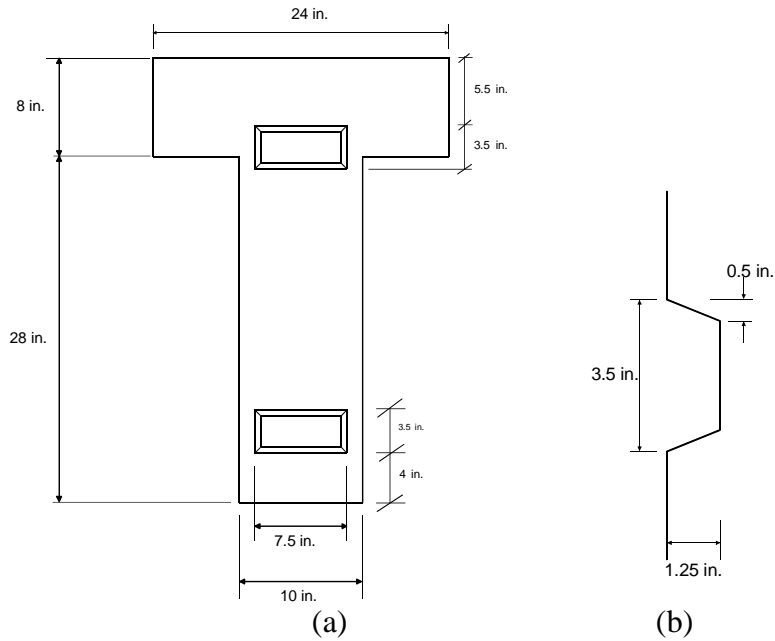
(a) Location of shear keys on beam cross section; (b) Detailed elevation view of shear key
